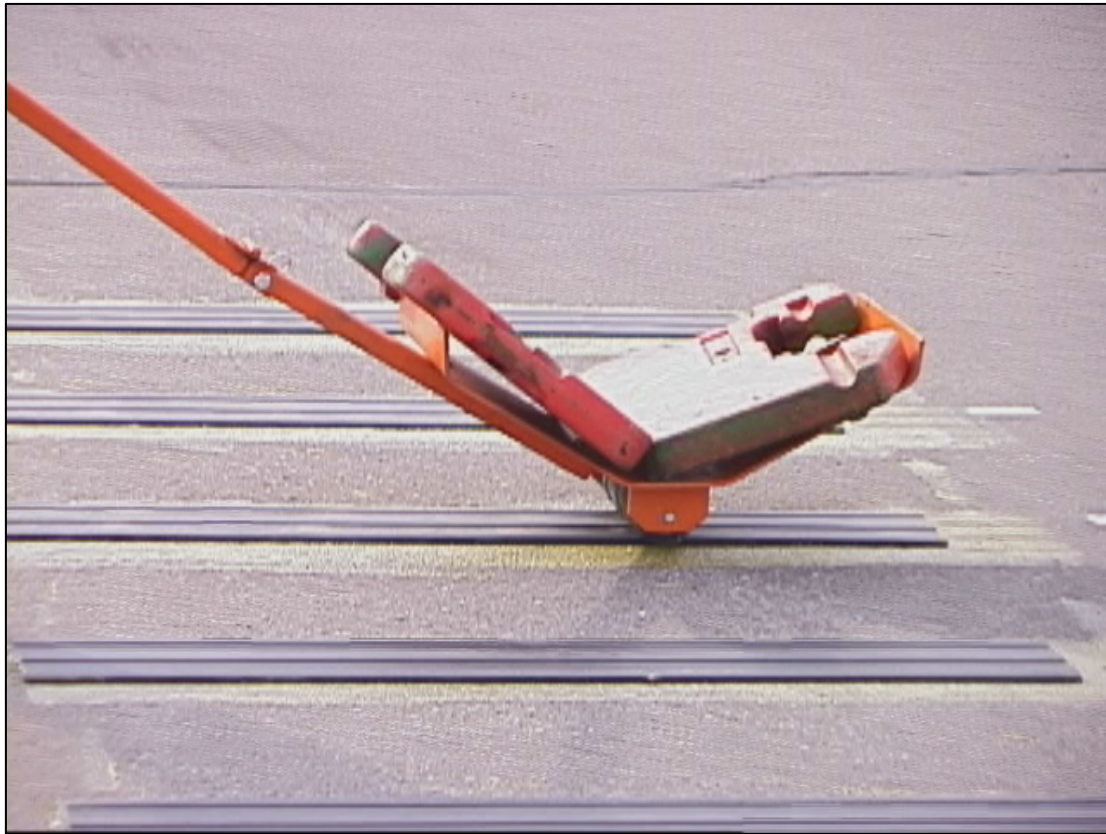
Tamper Cart with Custom Wheel Rolling Rumbler Rumble Strips
